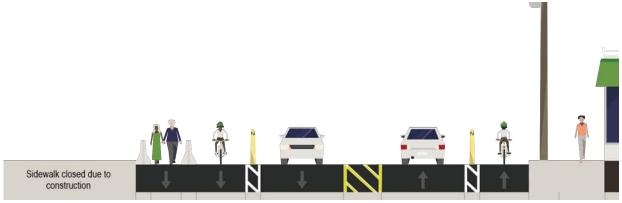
Proposed Cross Section of Evans Avenue between Rankin and Quint Streets, looking west
